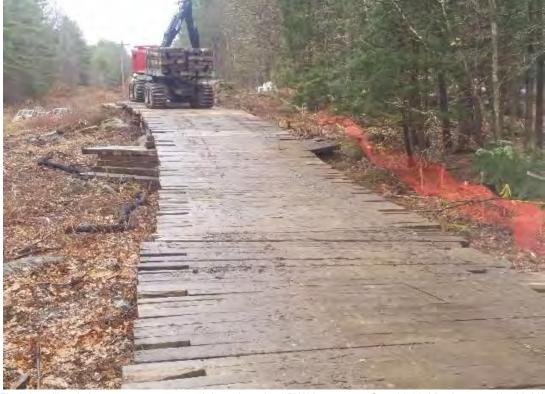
Installing timber mats on access road through wetland DW22, access to Strs. 89-90. Viewing east. (04-02-20).
